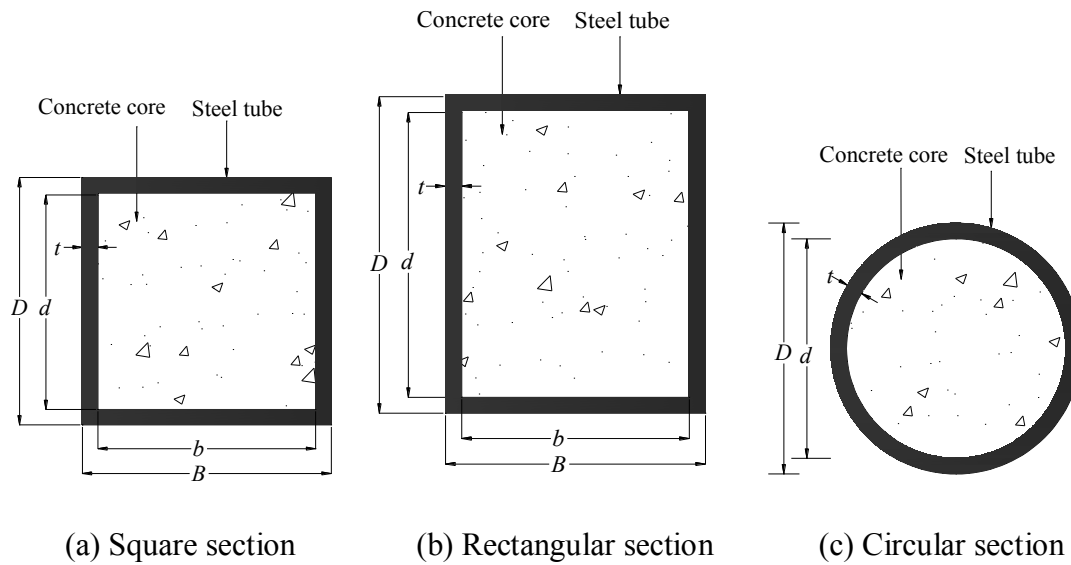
Cross-sections of concrete-filled steel tubular beam-columns.
